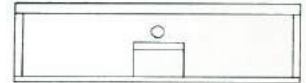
Rawl-sleeve & bolt for concrete floor.
